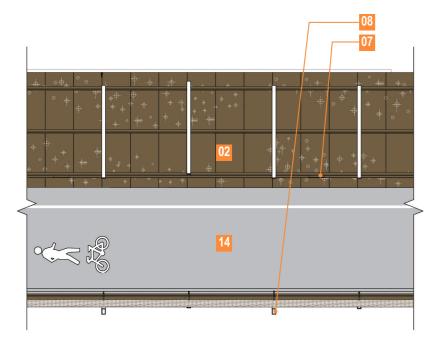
Ridge Street Active Transport Bridge - Plan C 1:100
